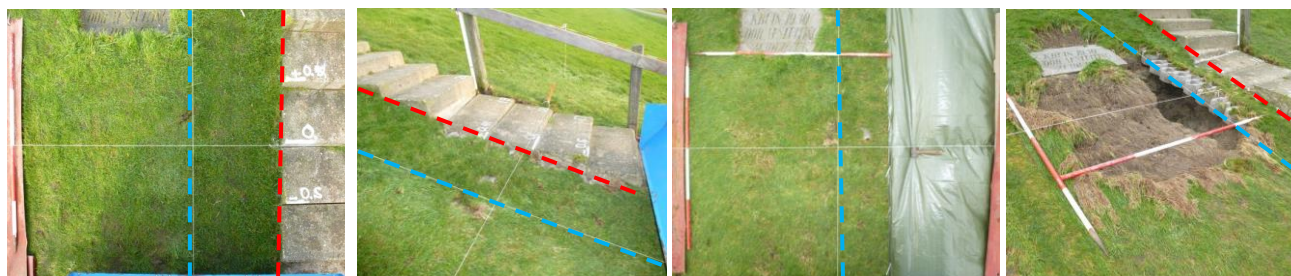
Impression of testing at stairs with open concrete blocks (Oo.5). From left to right: initial condition; after 600 impacts; after foil cover; damage after 3000 impacts (foil was removed before the picture was taken).
